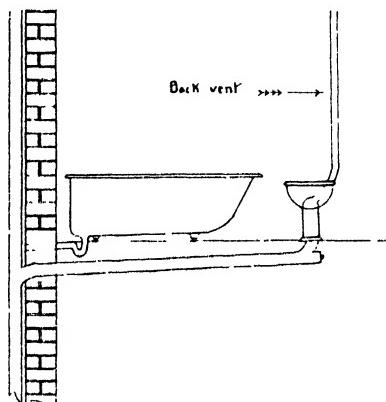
When a closet is more than 3 feet away from the soil vent pipe, it should be back vented to prevent syphonage of the closet trap.
